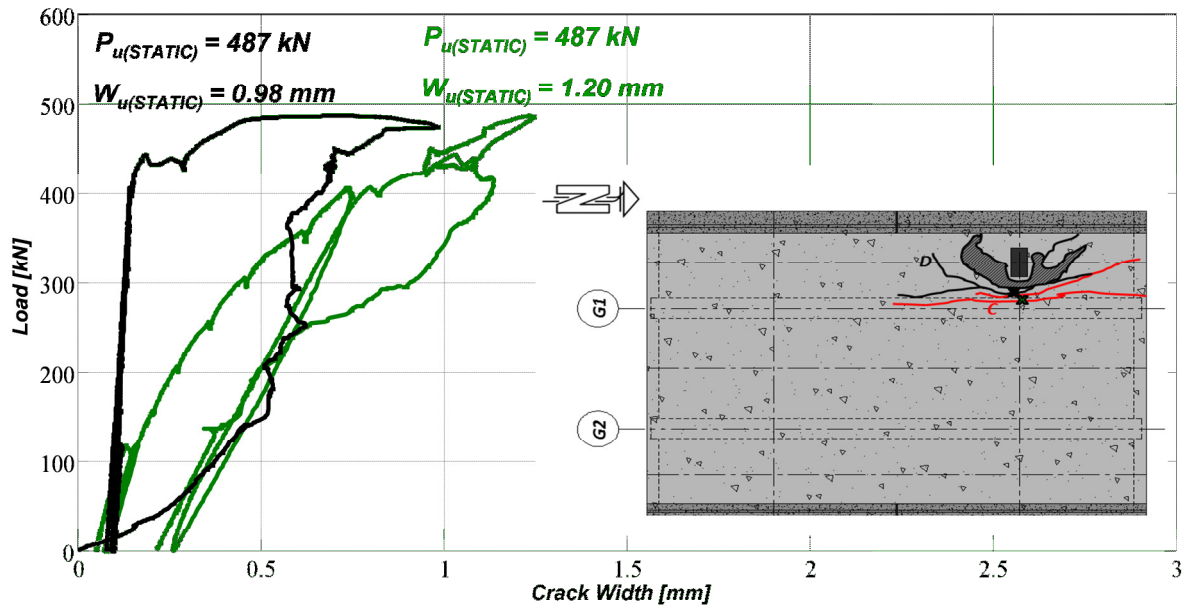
Plot of load versus top longitudinal crack widths for the cantilever section with GFRP reinforcement subjected to static monotonic loading
